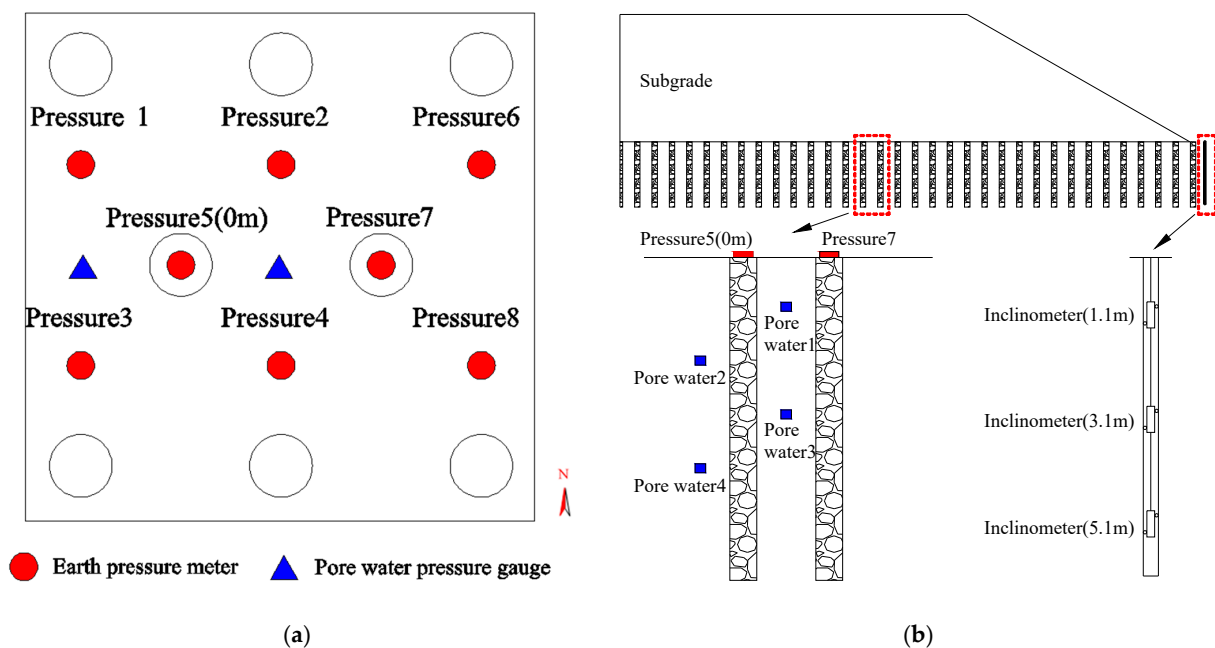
Buried sensors in the test area: (a) Plan layout of sensors; (b) Profile layout of sensors.
